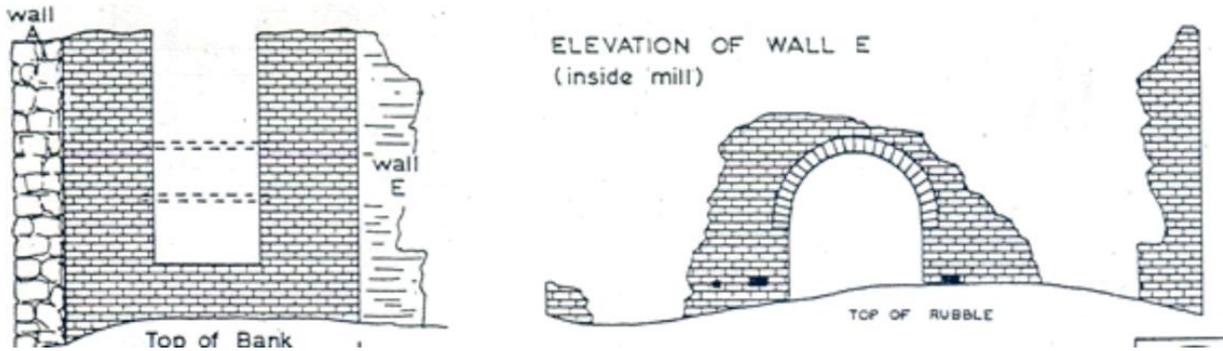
(Left) Elevation of the east wall of the water-wheel pit (Wall A), facing west.
